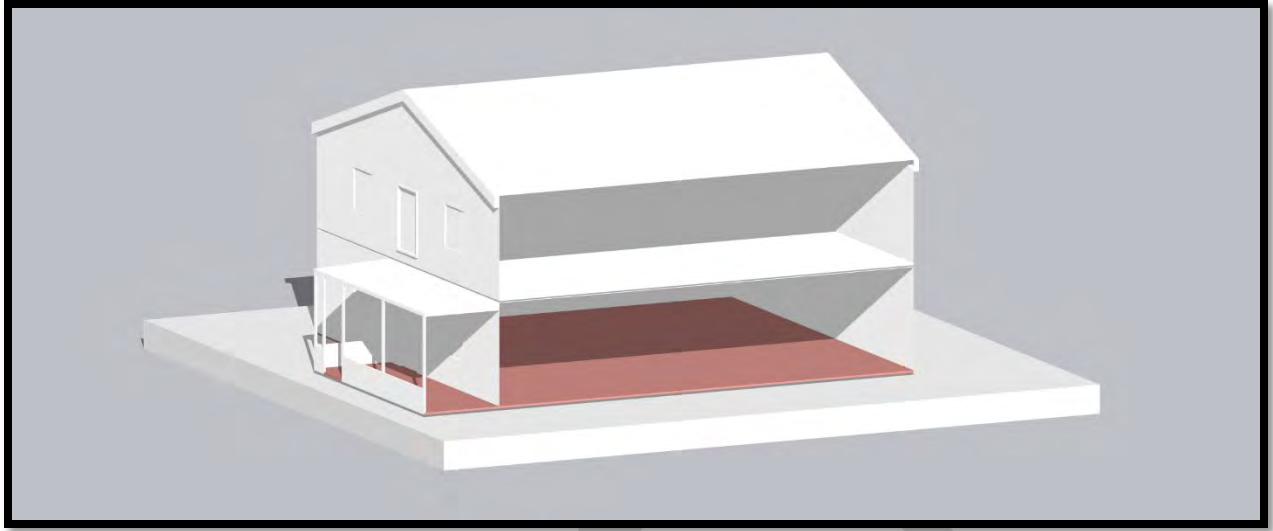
Graphic showing building footprint (red area) of a building with a porch.
